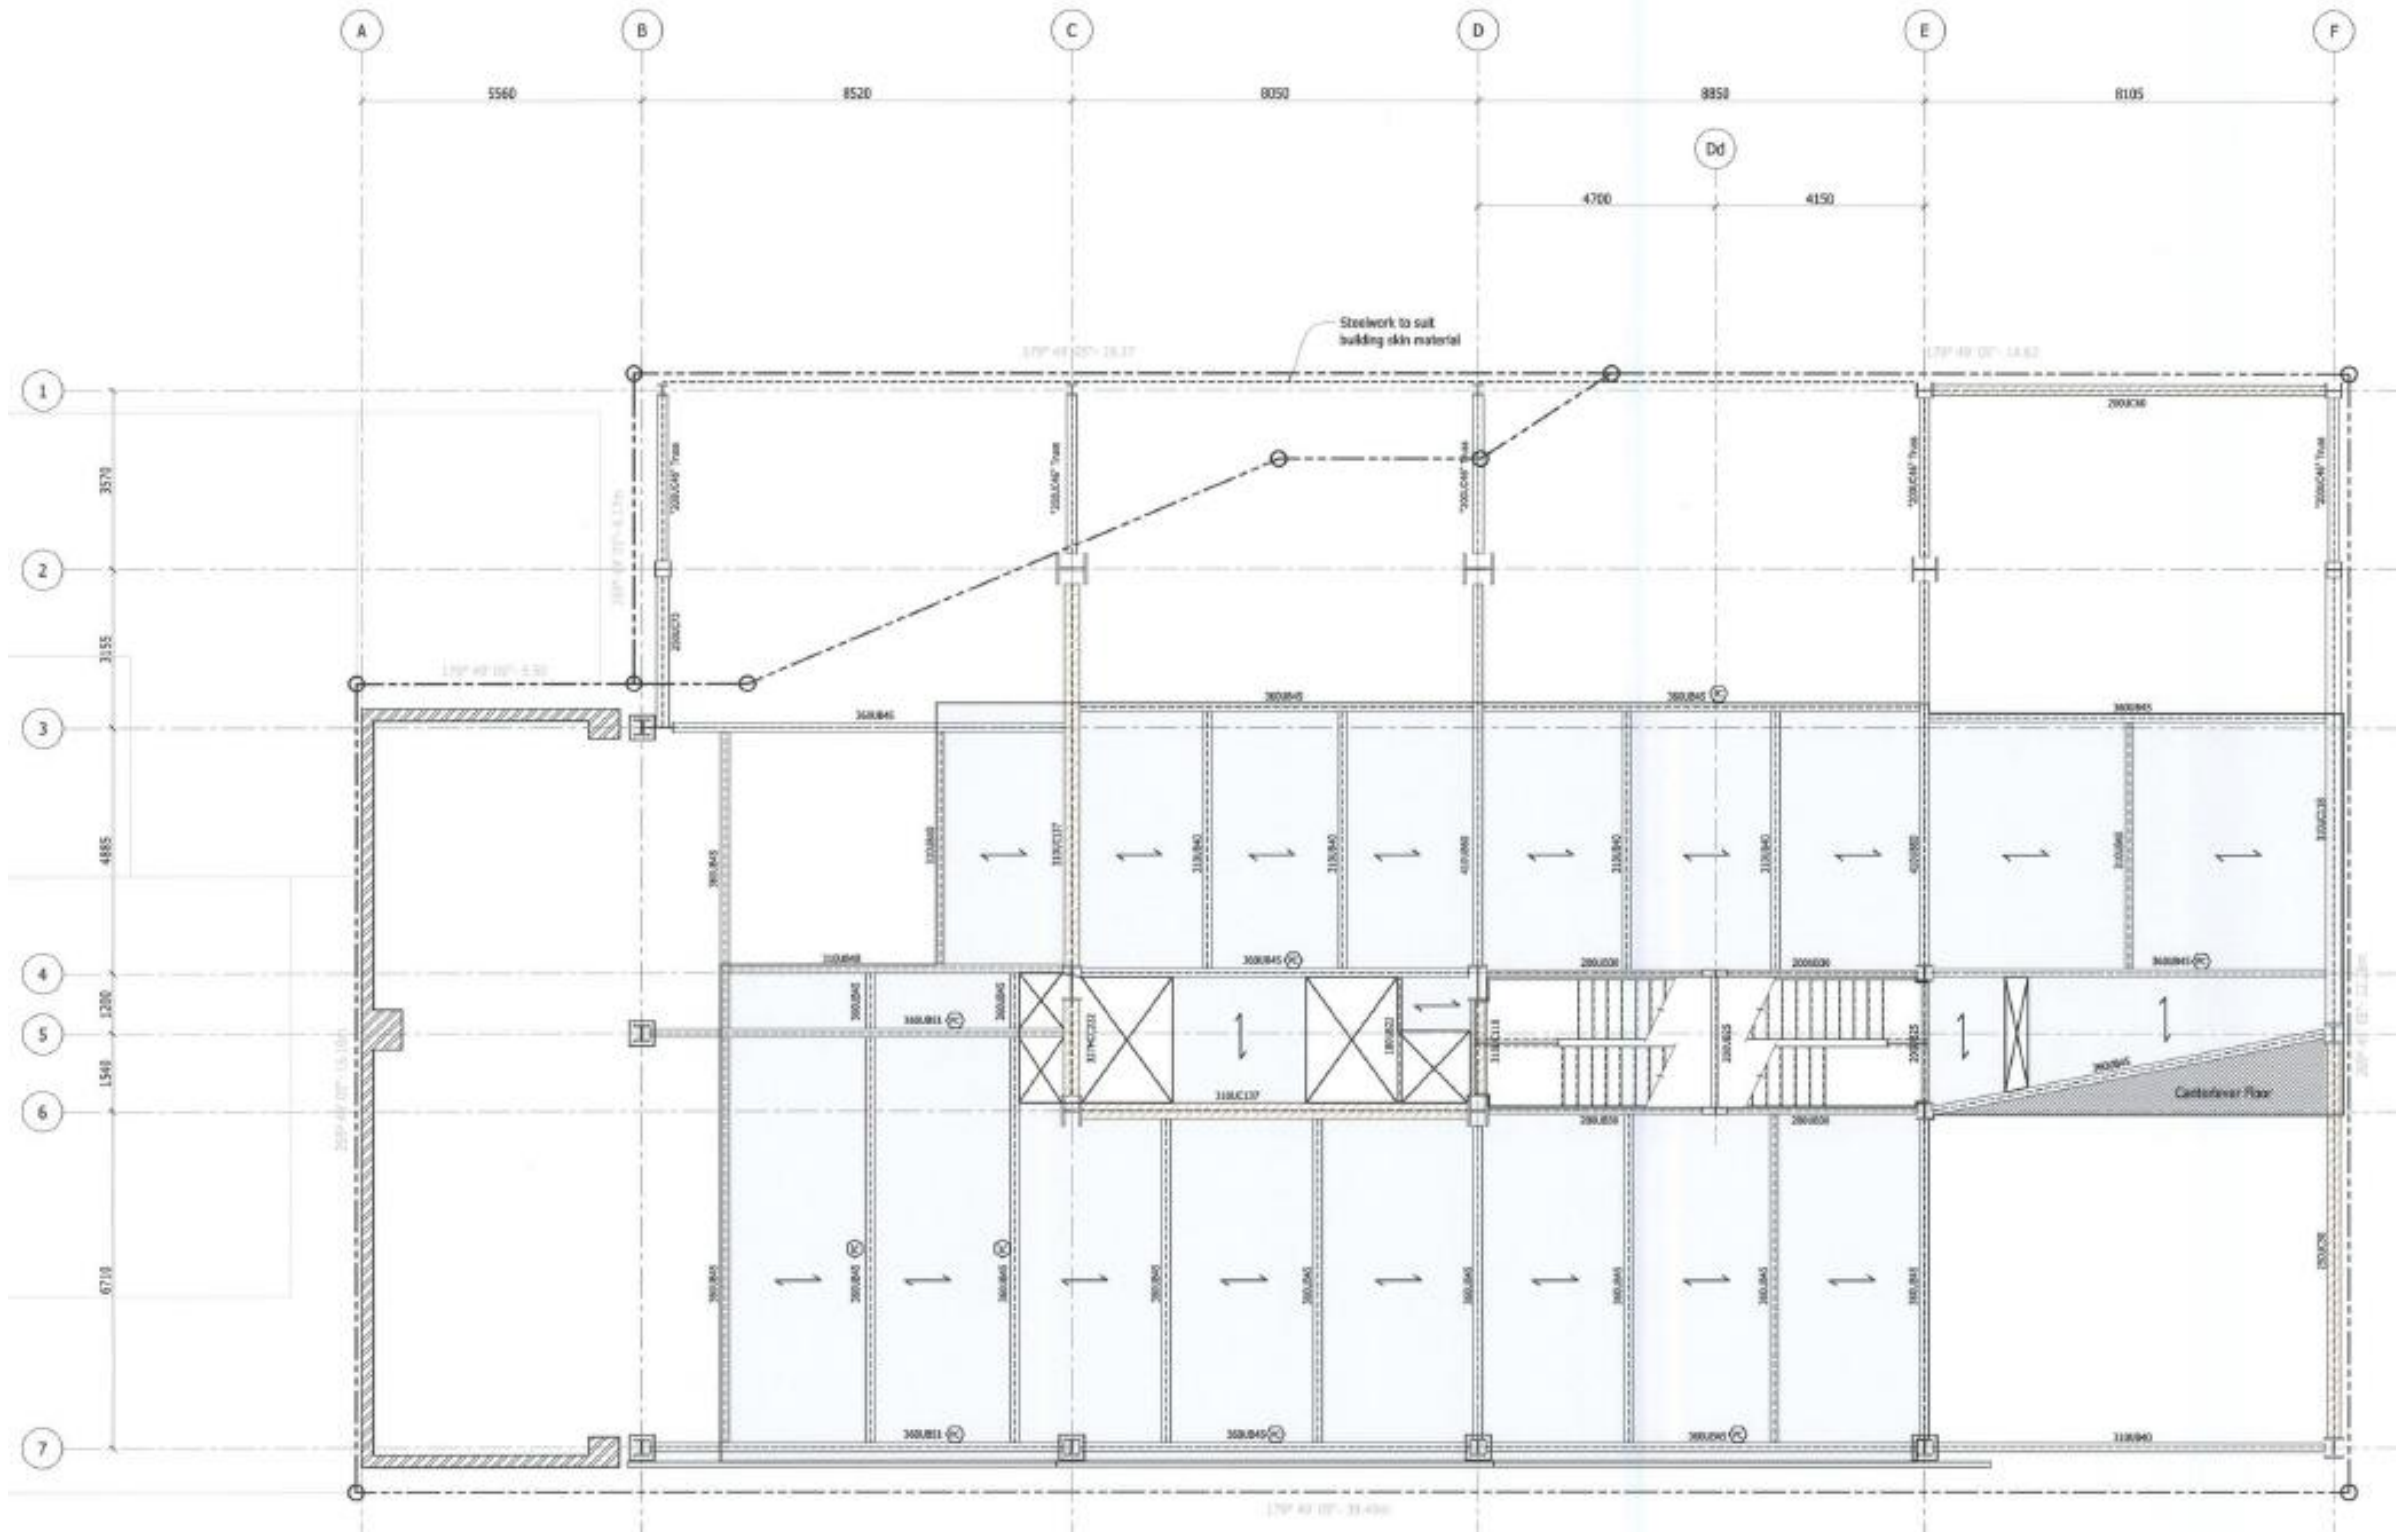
Structural Plan Level 3 (Christchurch City Council 2016c)
